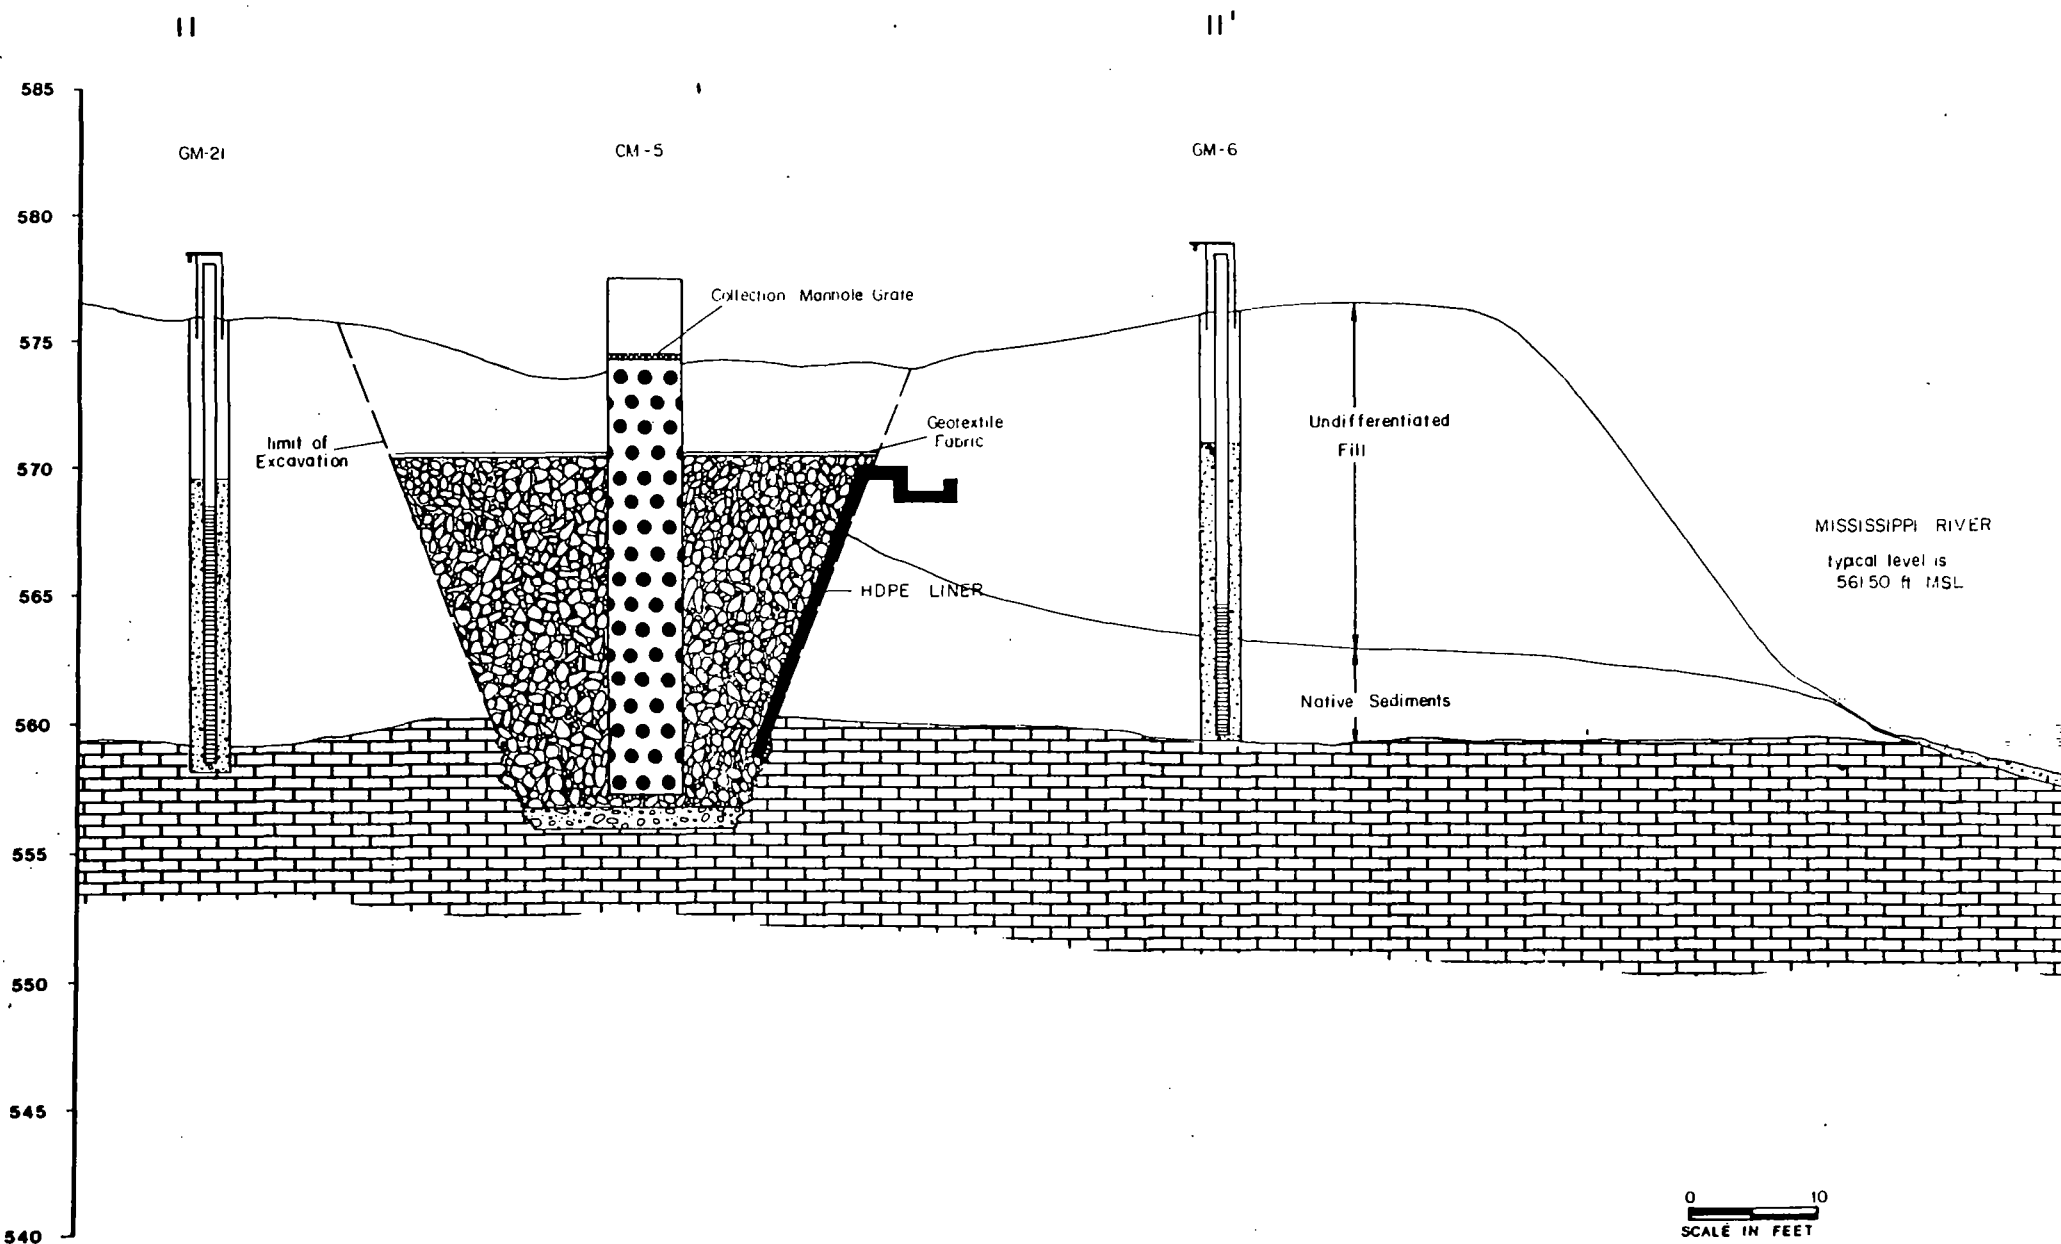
Cross Section II-II' of the Southeast Portion of the Oil-Interception Trench at the Alcoa-Davenport Waste Site.
